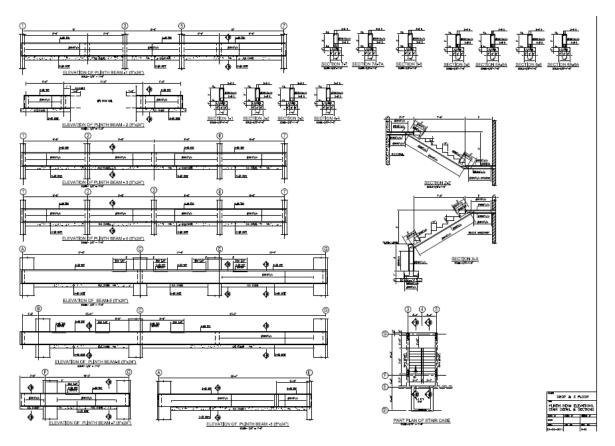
Structural beam elevations and sections for typical floor plan and staircase
